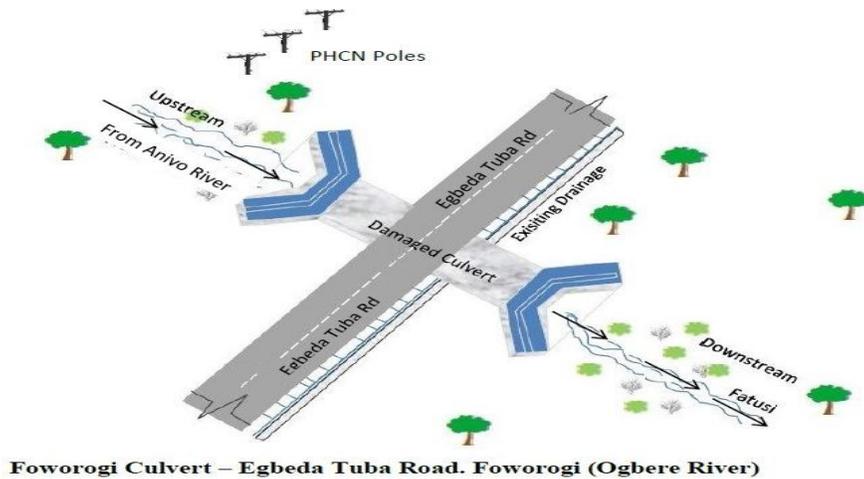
Foworogi Culvert – Egbeda Tuba Road Foworogi (Ogbere River) Schematic Layout
